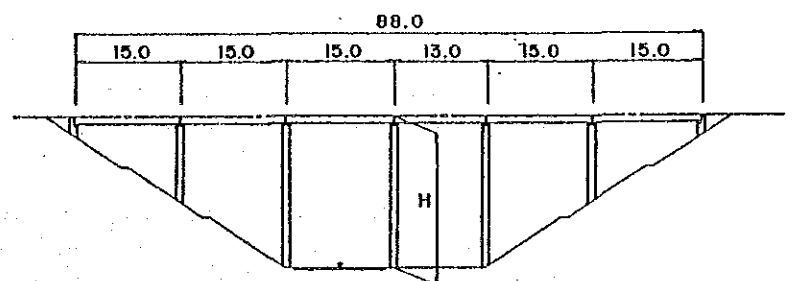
Standard Module of Over Bridge on Staged Construction
